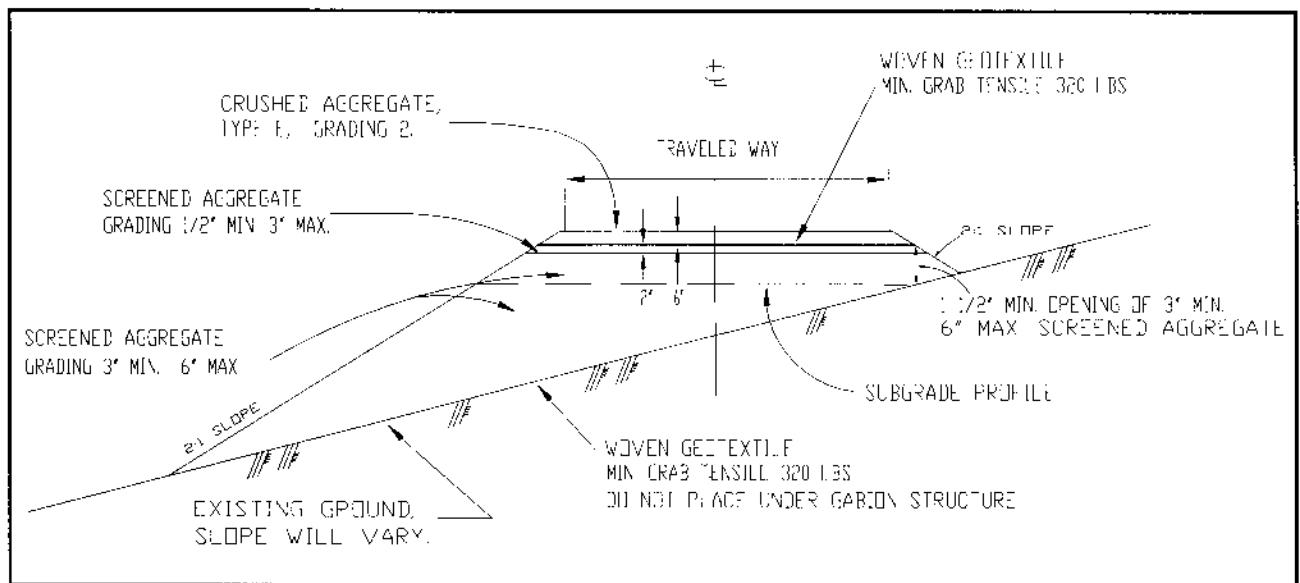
Typical section details for geotextile enveloped porous road embankment.
